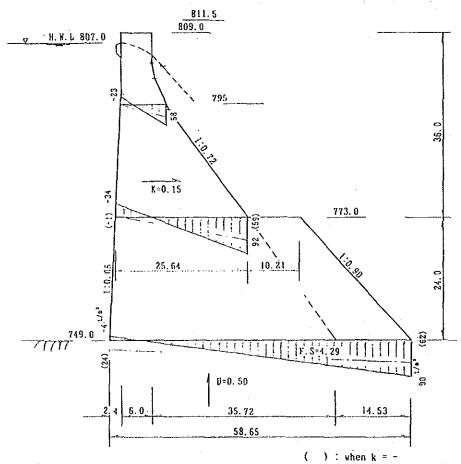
Stability Calculation Placing Concrete up to EL 773m E-146
